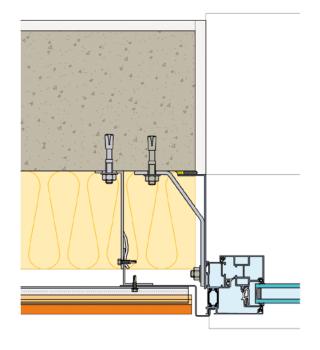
DETAIL: WINDOW FRAME FLUSH WITH OUTSIDE WALL
